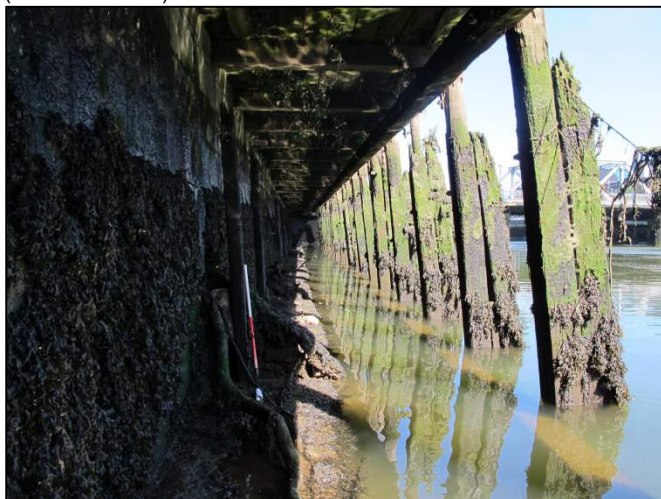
East-facing view along the base of timber wharf located upstream of Brian Boru Bridge (1m scale).
